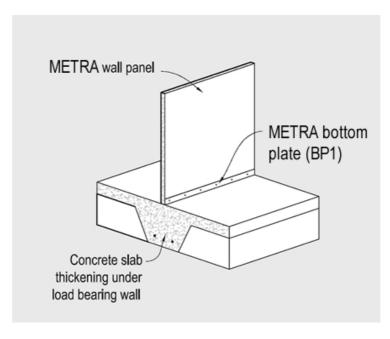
Load Bearing Interior Wall - Floor Thickening
